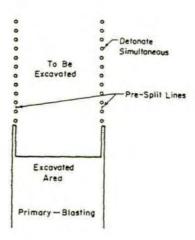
Typical Layout for Presplit Holes (after DuPont Blasters Handbook, 1966)
